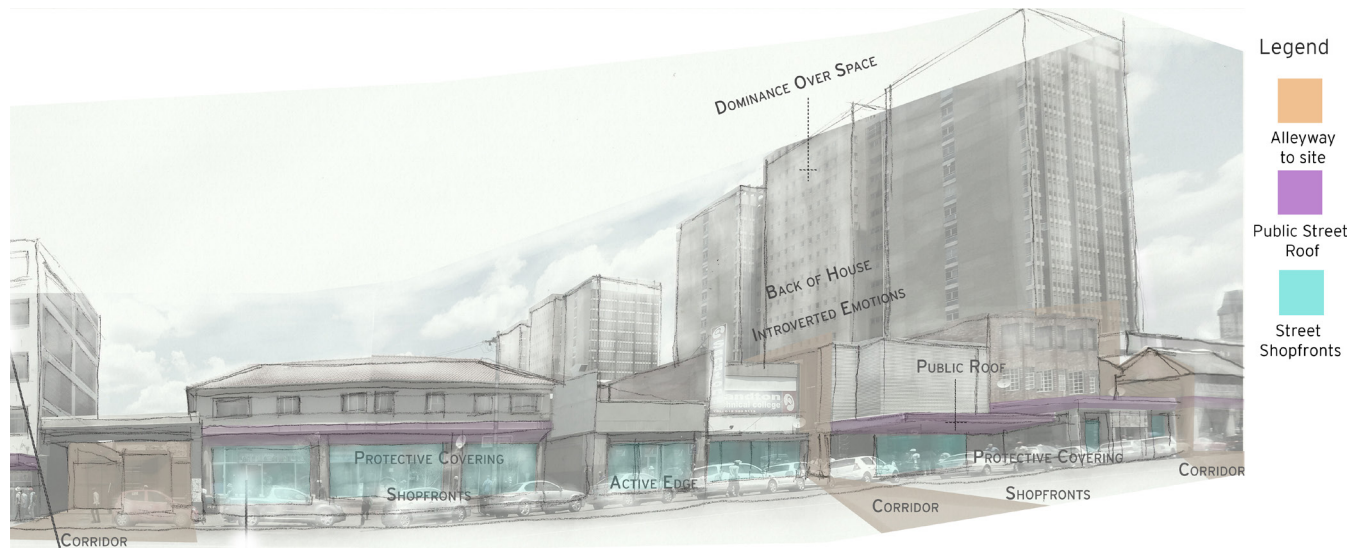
[VIEW 2] PERSPECTIVE OF SITE STREET FACADE ON HELEN JOSEPH STREET (AUTHOR 2015)
